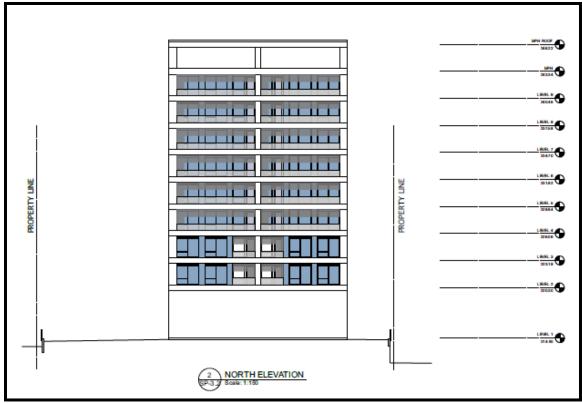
2023 Proposed Development at 6179 Lundy's Lane - North Elevation (Provided by MB1 Urban Planning 2023)
